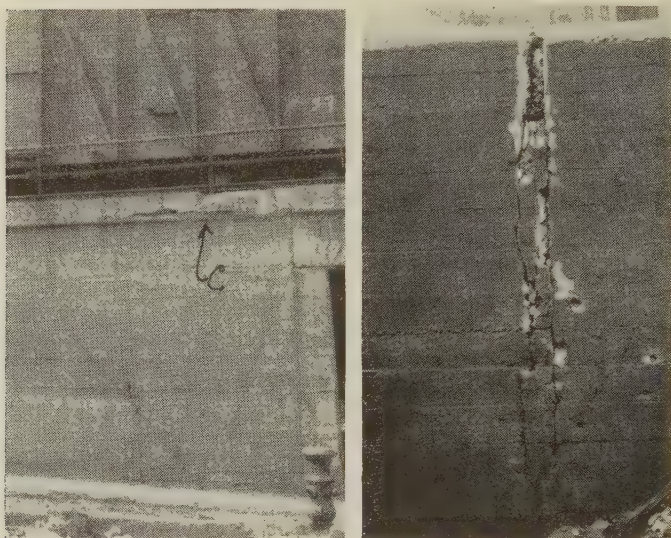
RETAINING WALL COPING FAILS BY COMPRESSION DUE TO INSUFFICIENT PROVISION FOR EXPANSION BETWEEN GIRDER AND WALL
